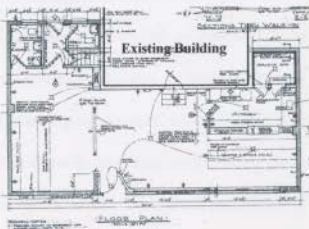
Floor plan of the remodel to John Siri's residence. The existing house is noted. University of Nevada – Reno Special Collections Library; Frederic J. DeLongchamps drawing file
